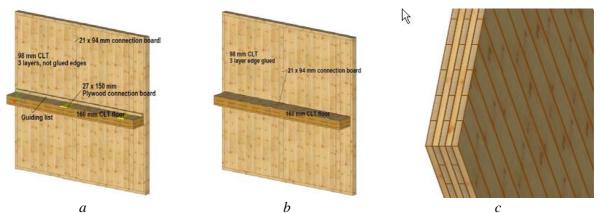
The two test sections. Section without glued board edges (a), section with glued board edges (b) and detail from the CLT construction (c)
